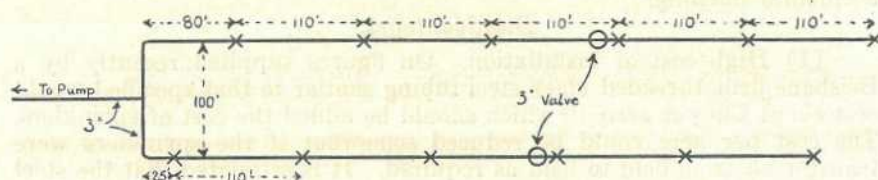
Plan of the Pipe-line System installed at Ayr for Experimental Purposes.
